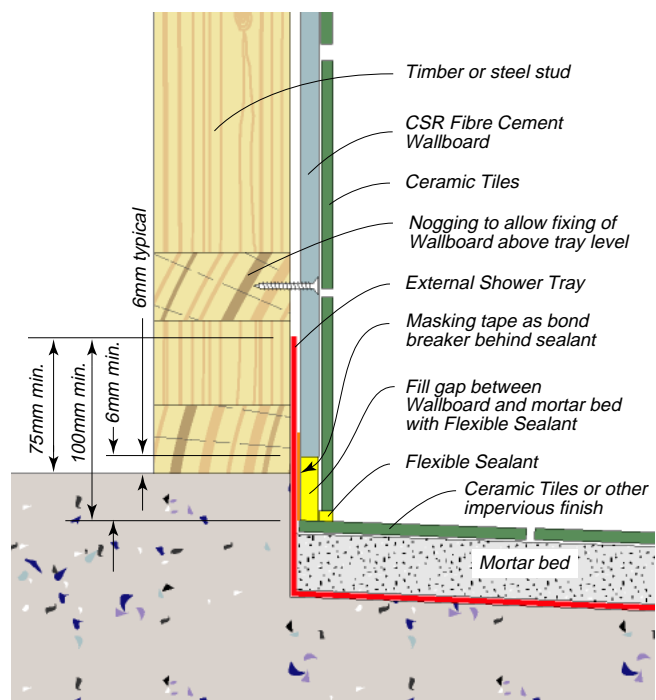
TYPICAL DETAIL FOR EXTERNAL SHOWER TRAY.
